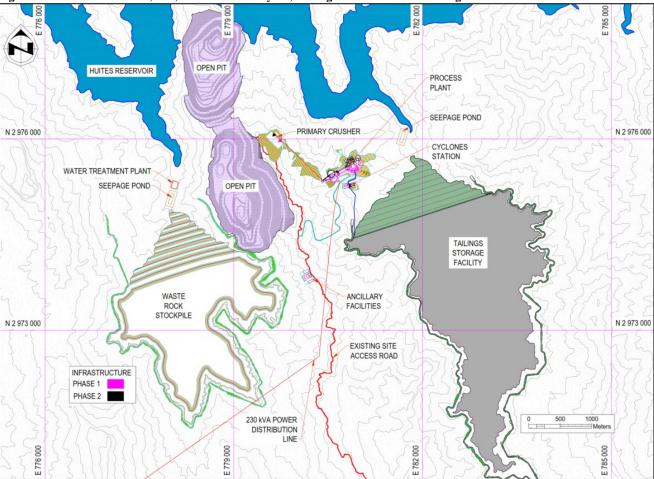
Mine Infrastructure, Pits, Process Plant Layout, Tailings and Waste Rock Storage Facilities
